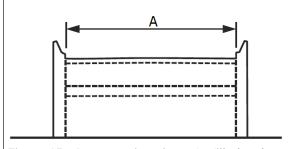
Cross-section view of a filled arch bridge or culvert under fill with headwalls.
